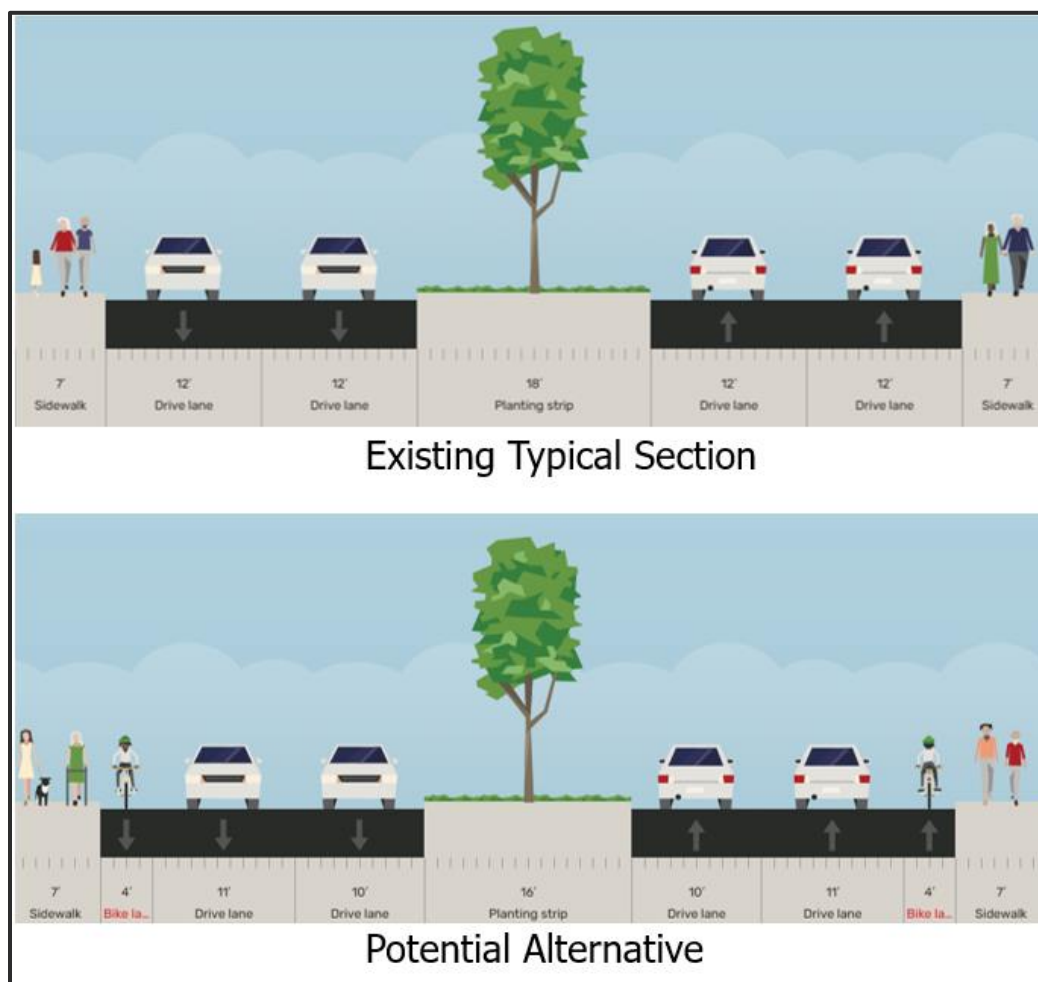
Lake Ida Road / NE 4 Street Existing and Potential Alternative Typical Section
